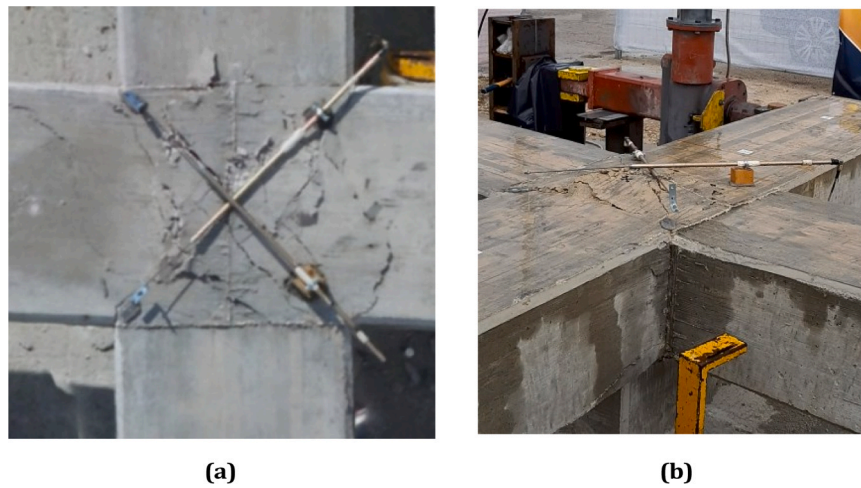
(a) Details of a cracked unreinforced beam-column joint; (b) Prospective view of a cracked unreinforced beam-column joint with evidence of the dilatation of the concrete occurred in the direction perpendicular to the frame plane. Both the pictures refer to a very advanced stage of the last monotonic part of the cyclic test.
